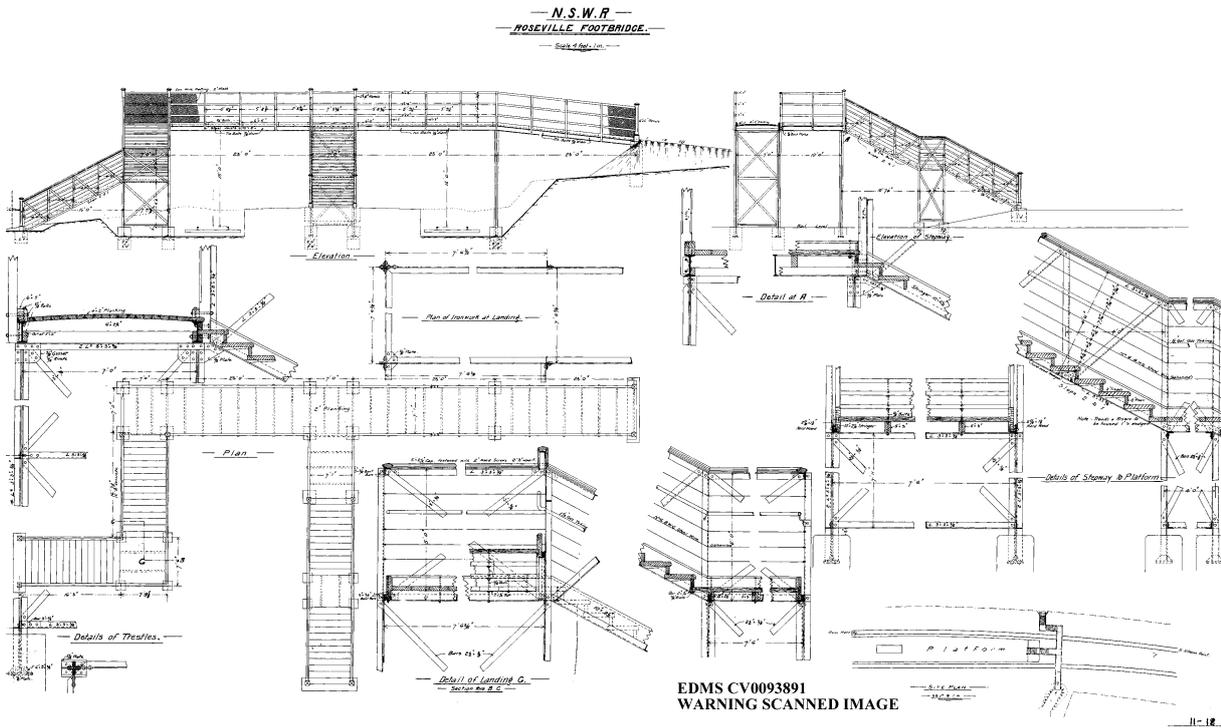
Plan of Roseville Station footbridge. (Source: Transport for NSW)
